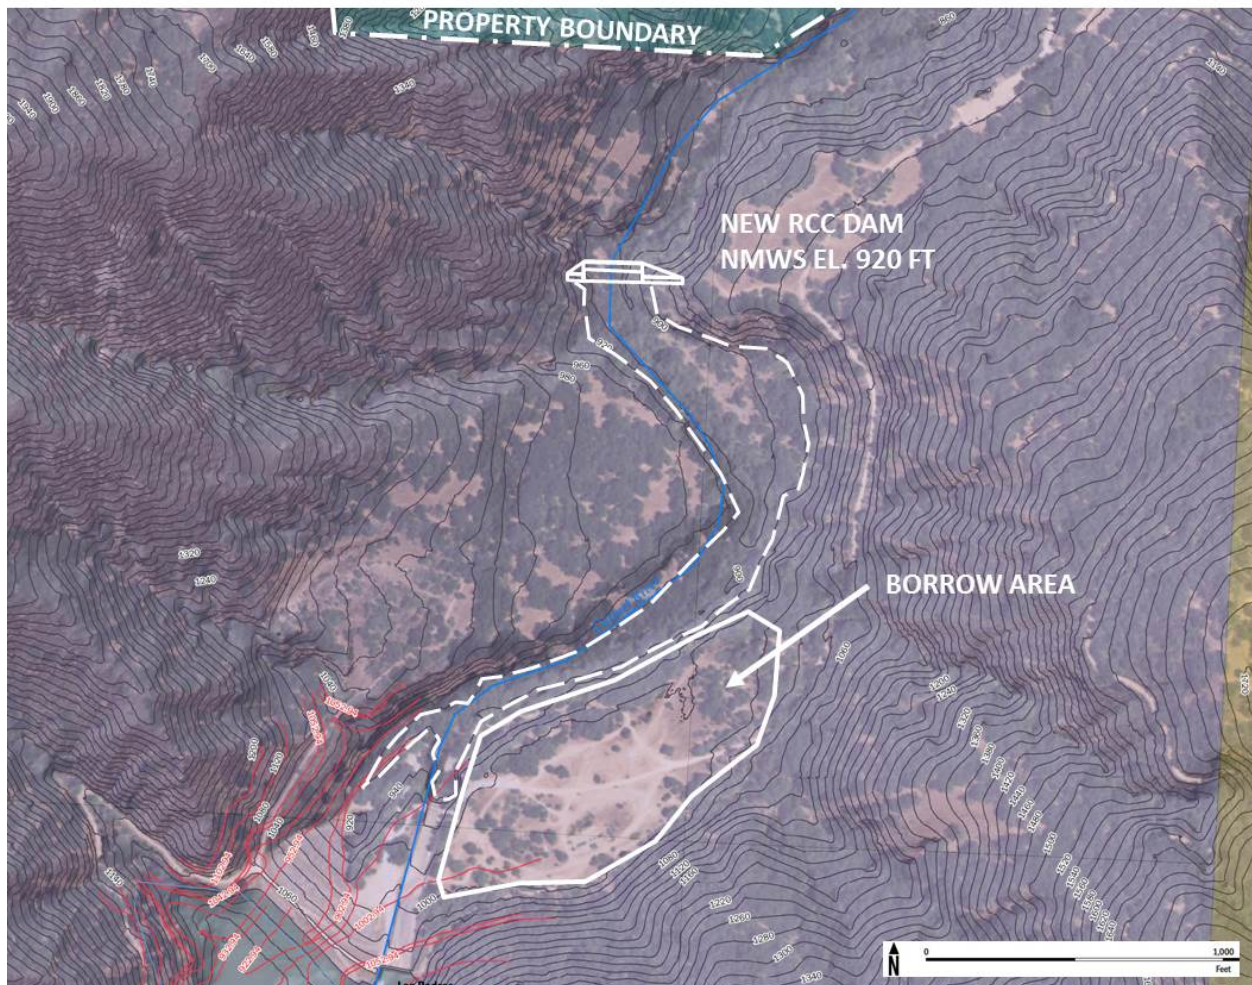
Alternative 4d New Downstream Roller-Compacted Concrete Dam Used With Alternatives 4a or 4b
